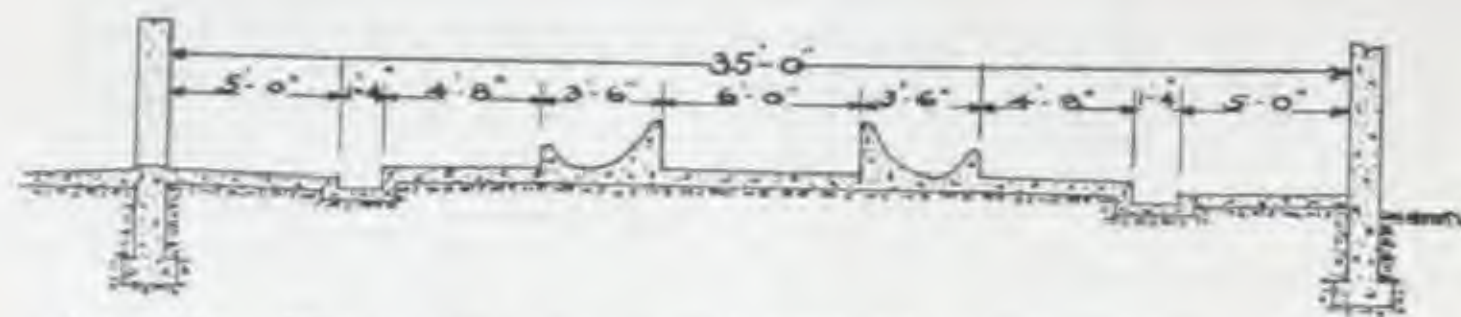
Floor as in Fig. 60 and 61—full width of barn.
